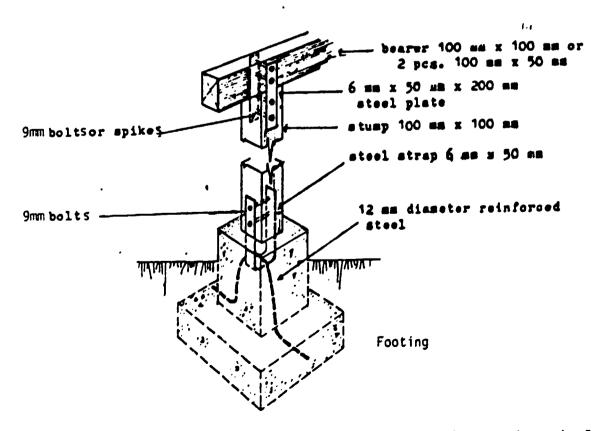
Shows blob footing arrangement to elevate wood stump above the G.L. (ground level).
